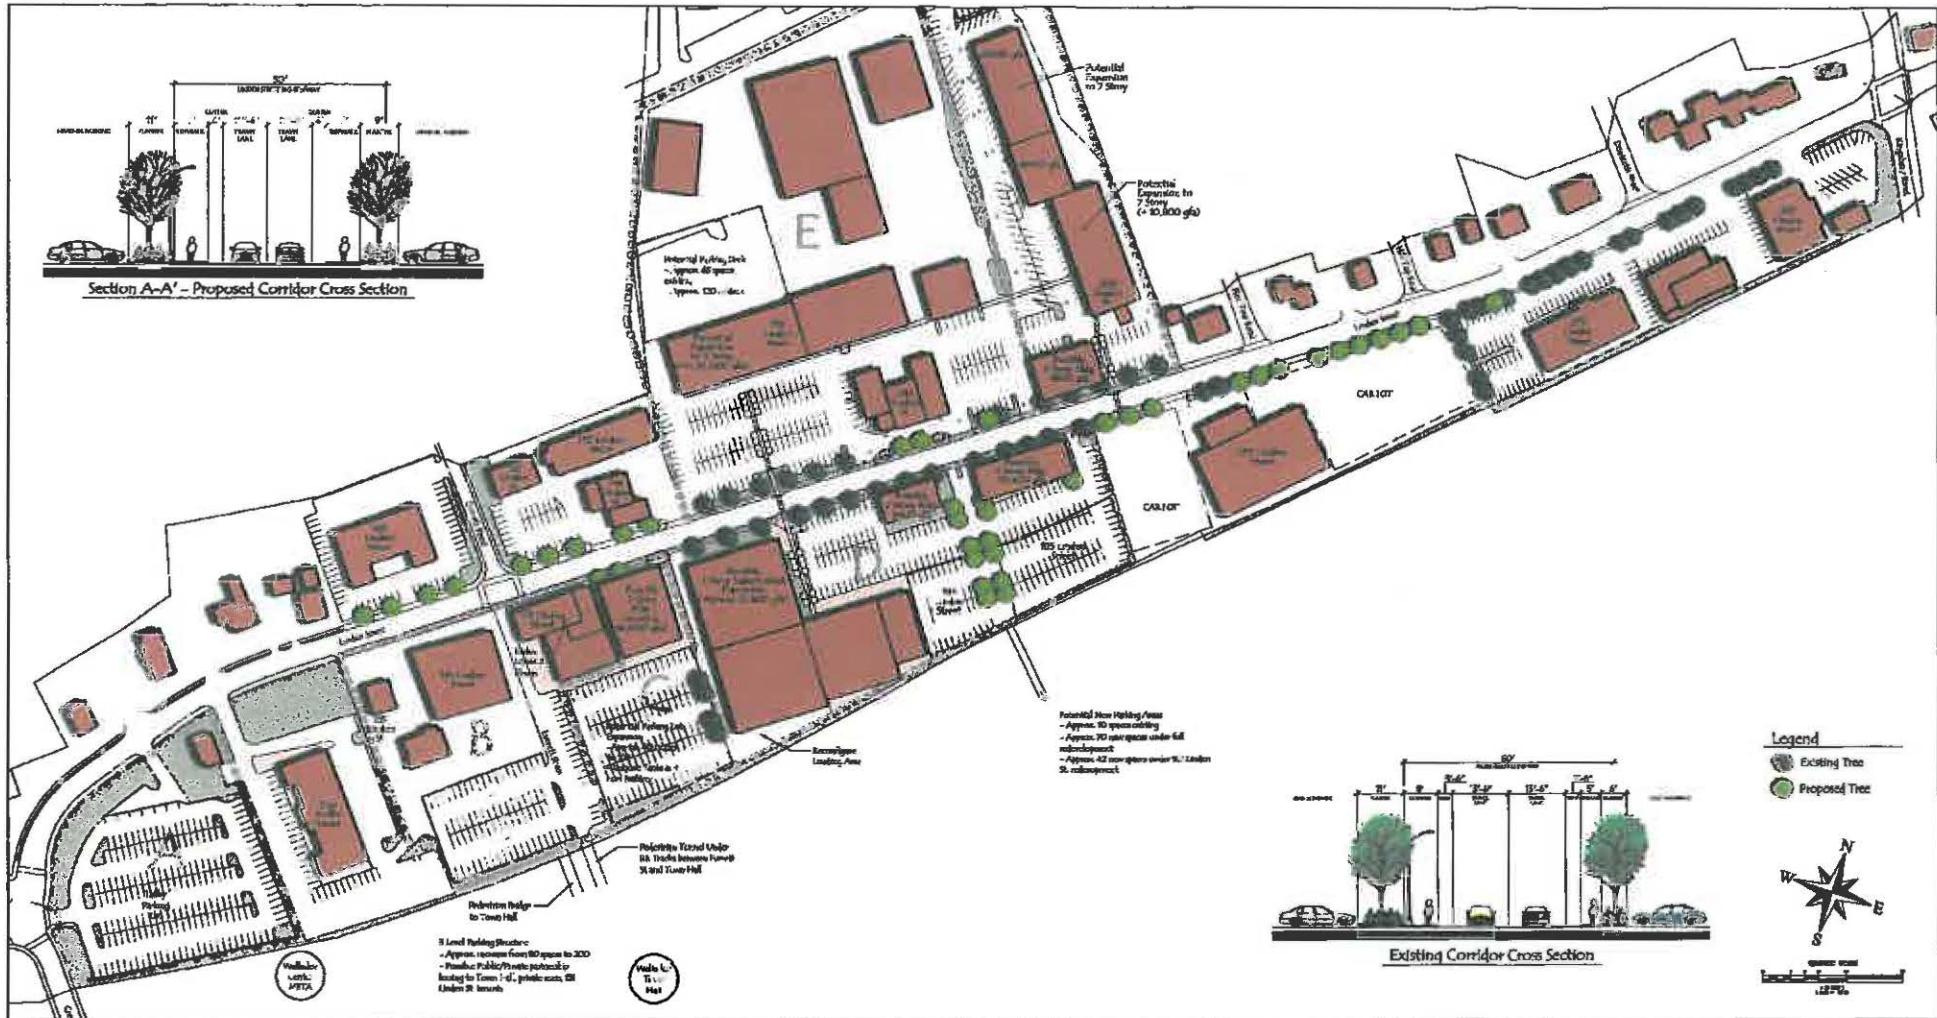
C: Linden Street Corridor Improvement Plan - Crest Road to Weston Road
